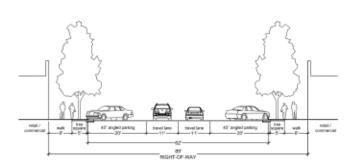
(2). Typical Major Local Urban Street A Alternative with Angled Parking on both sides
